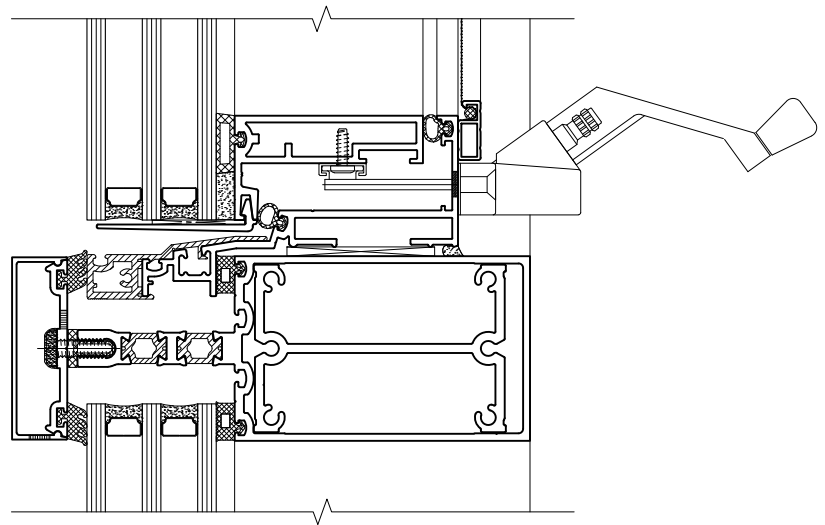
DETAILS SHOWING PROJECT OUT PHANTOM VENT WINDOW INSTALLED INTO THERMAWALL 2600
